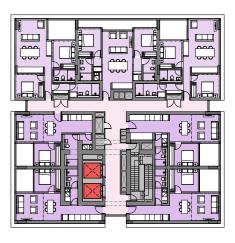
Building B refined Low rise Floorplate, 1:500
